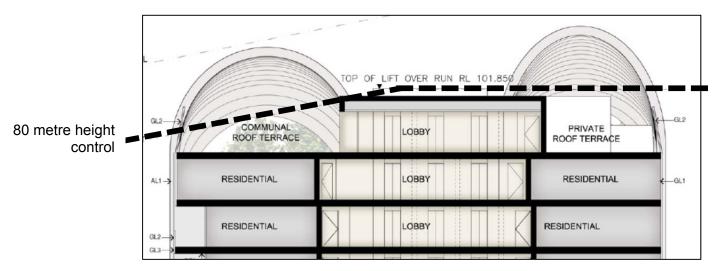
East-West section illustrating the breach of the lift overrun and architectural roof feature to the building height development standard
